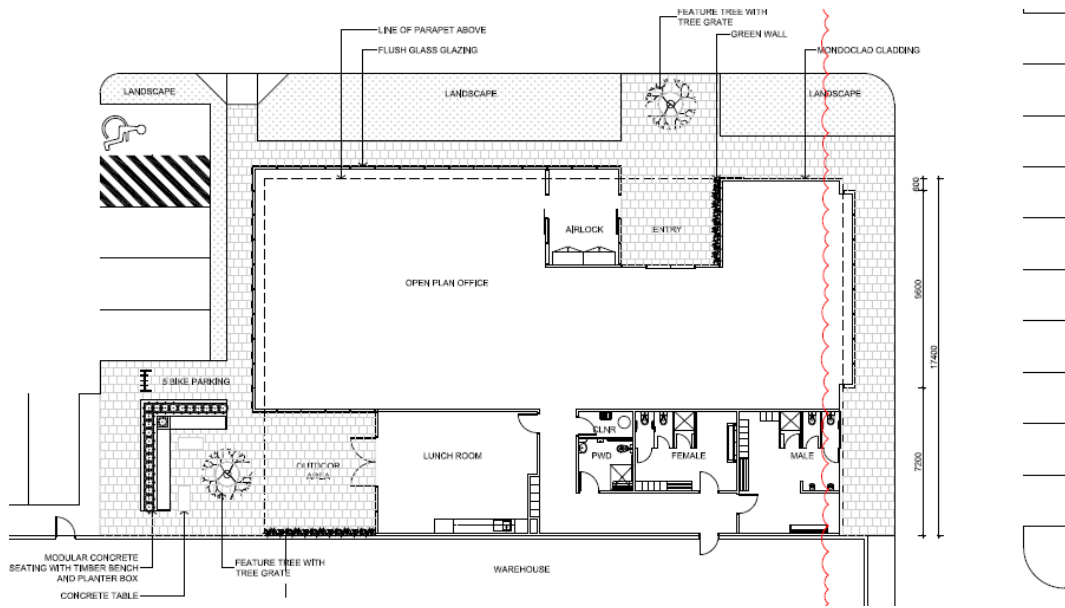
Proposed office floor plan (Source: Frasers Property)
